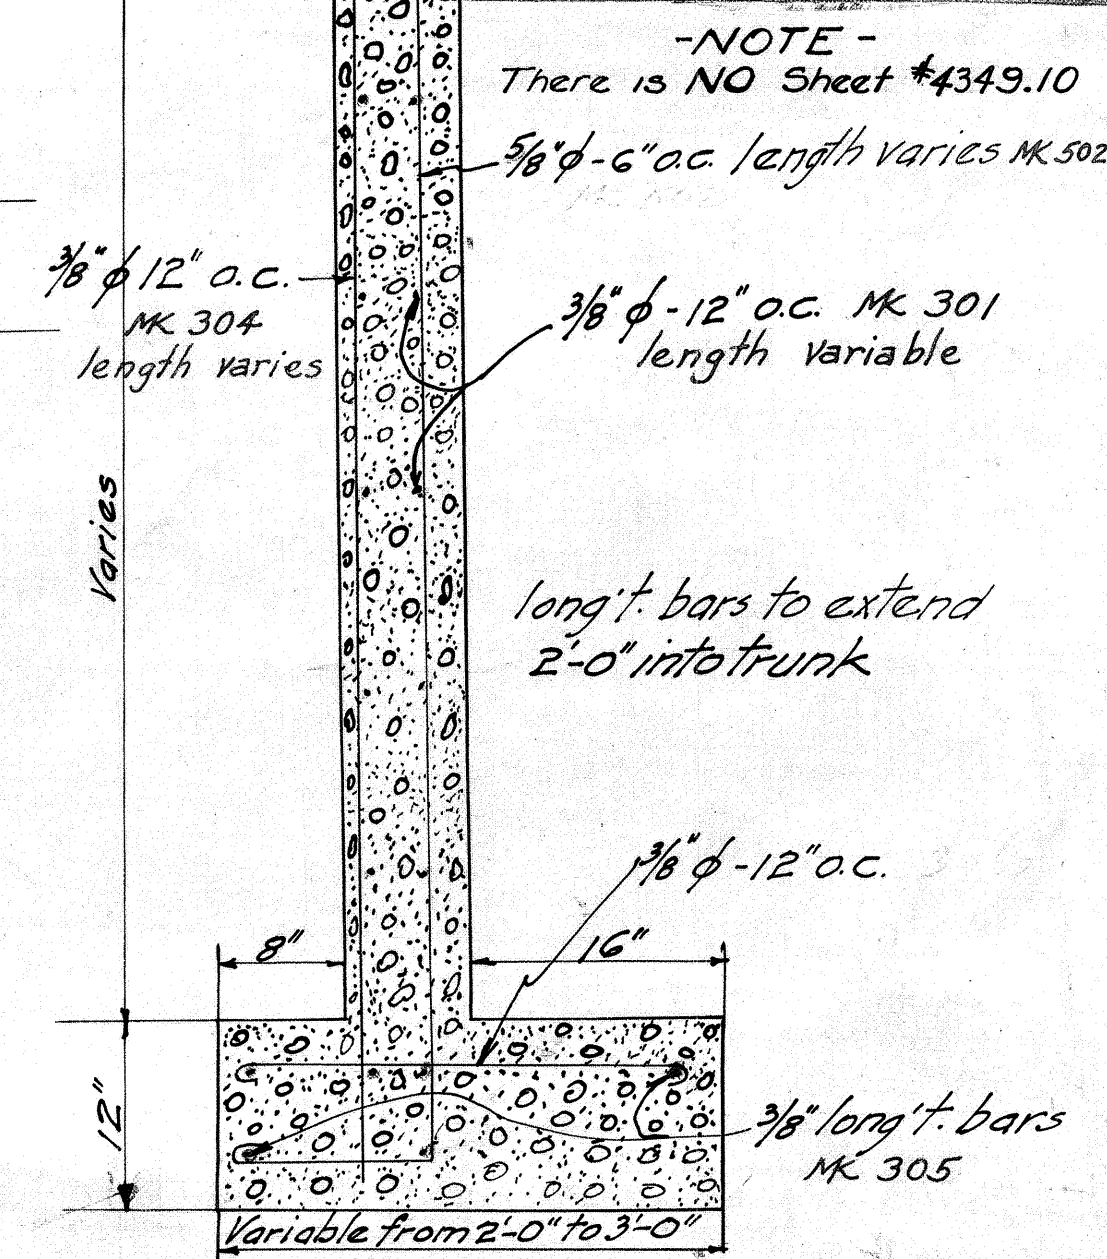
'X10'REINFORCED CONCRETE CULVERT
